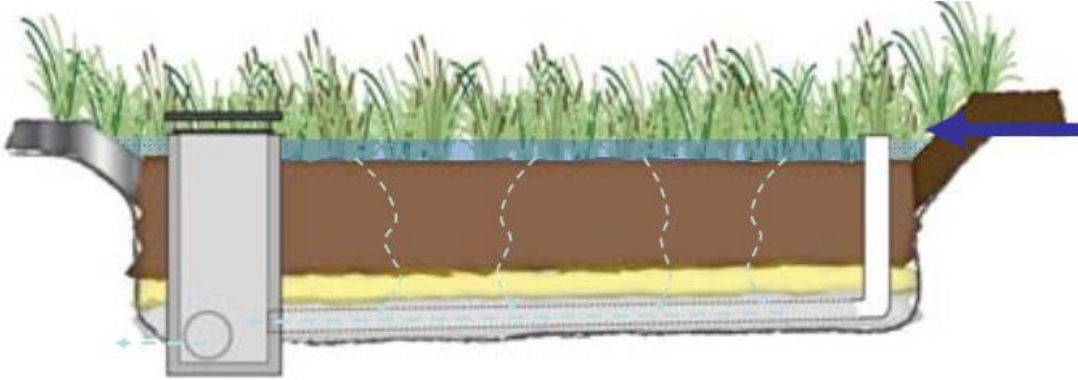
Typical Section of a generic Bio-Detention system (Source: Water by Design)
